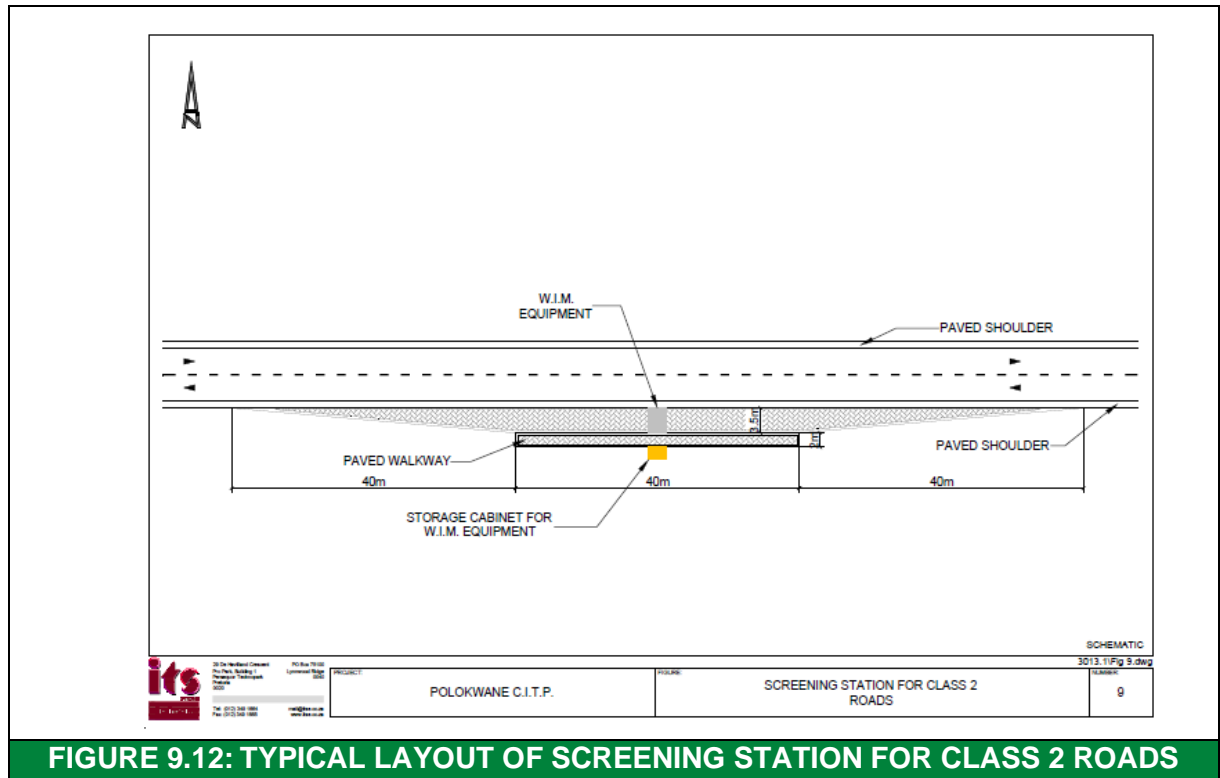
TYPICAL LAYOUT OF SCREENING STATION FOR CLASS 2 ROADS
